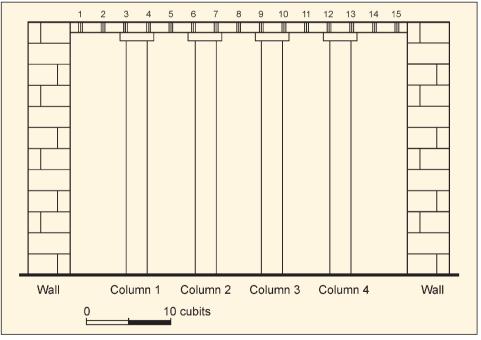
Cross-section of Solomon's 'House of Lebanon' palace with side-walls, four rows of pillars and 45 planks
